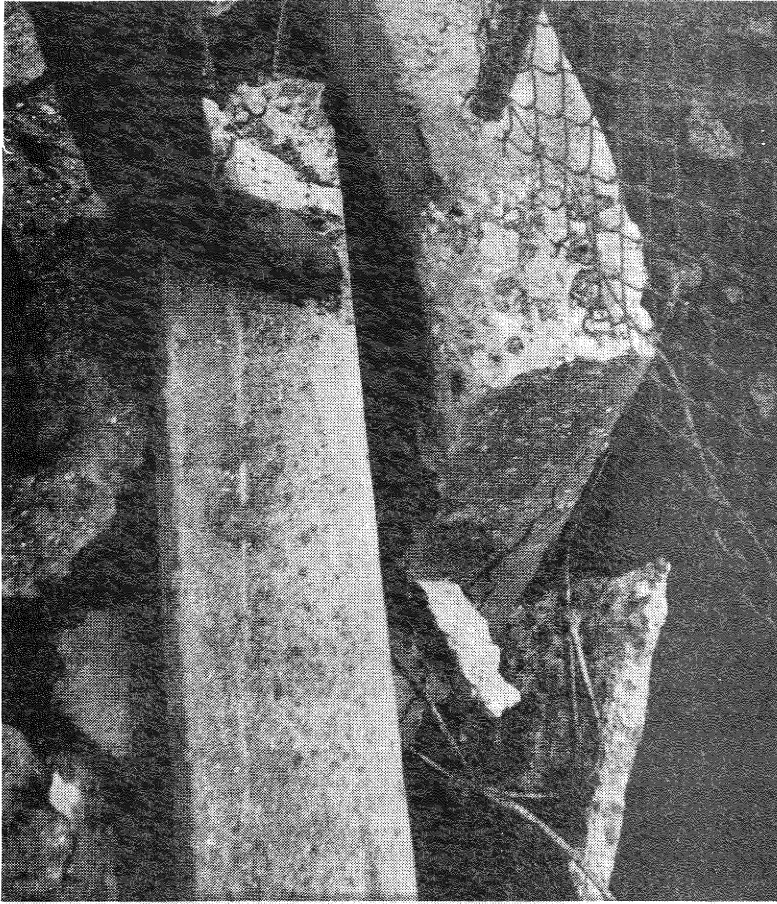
Telescoping of reinforced concrete wall of channel leading from Lopez Canyon.
